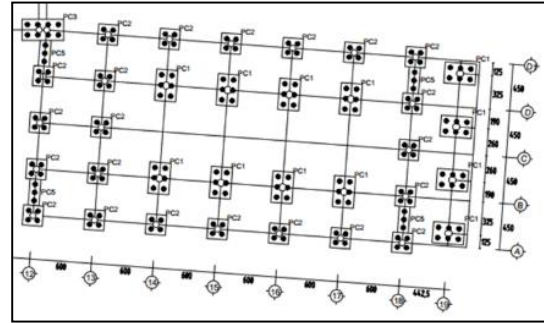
Foundation Plan of the Nurul Haq Shelter [8]
